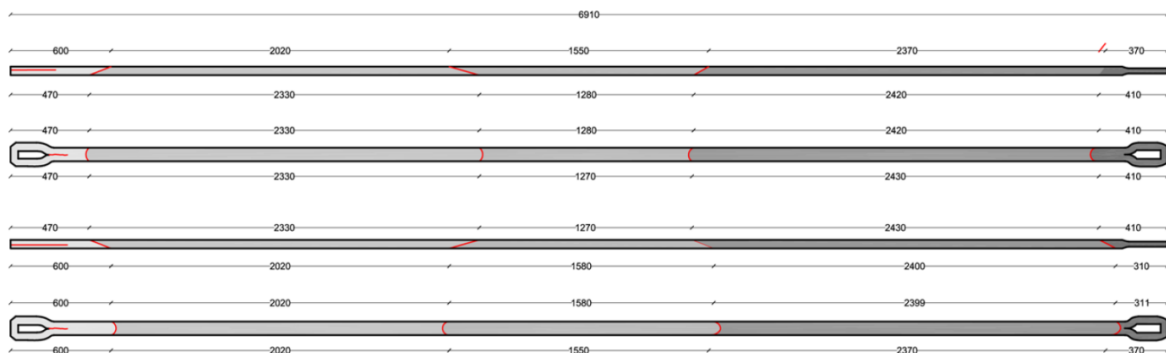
Welding lines present in the tie rod 61-91, of the four different faces.
